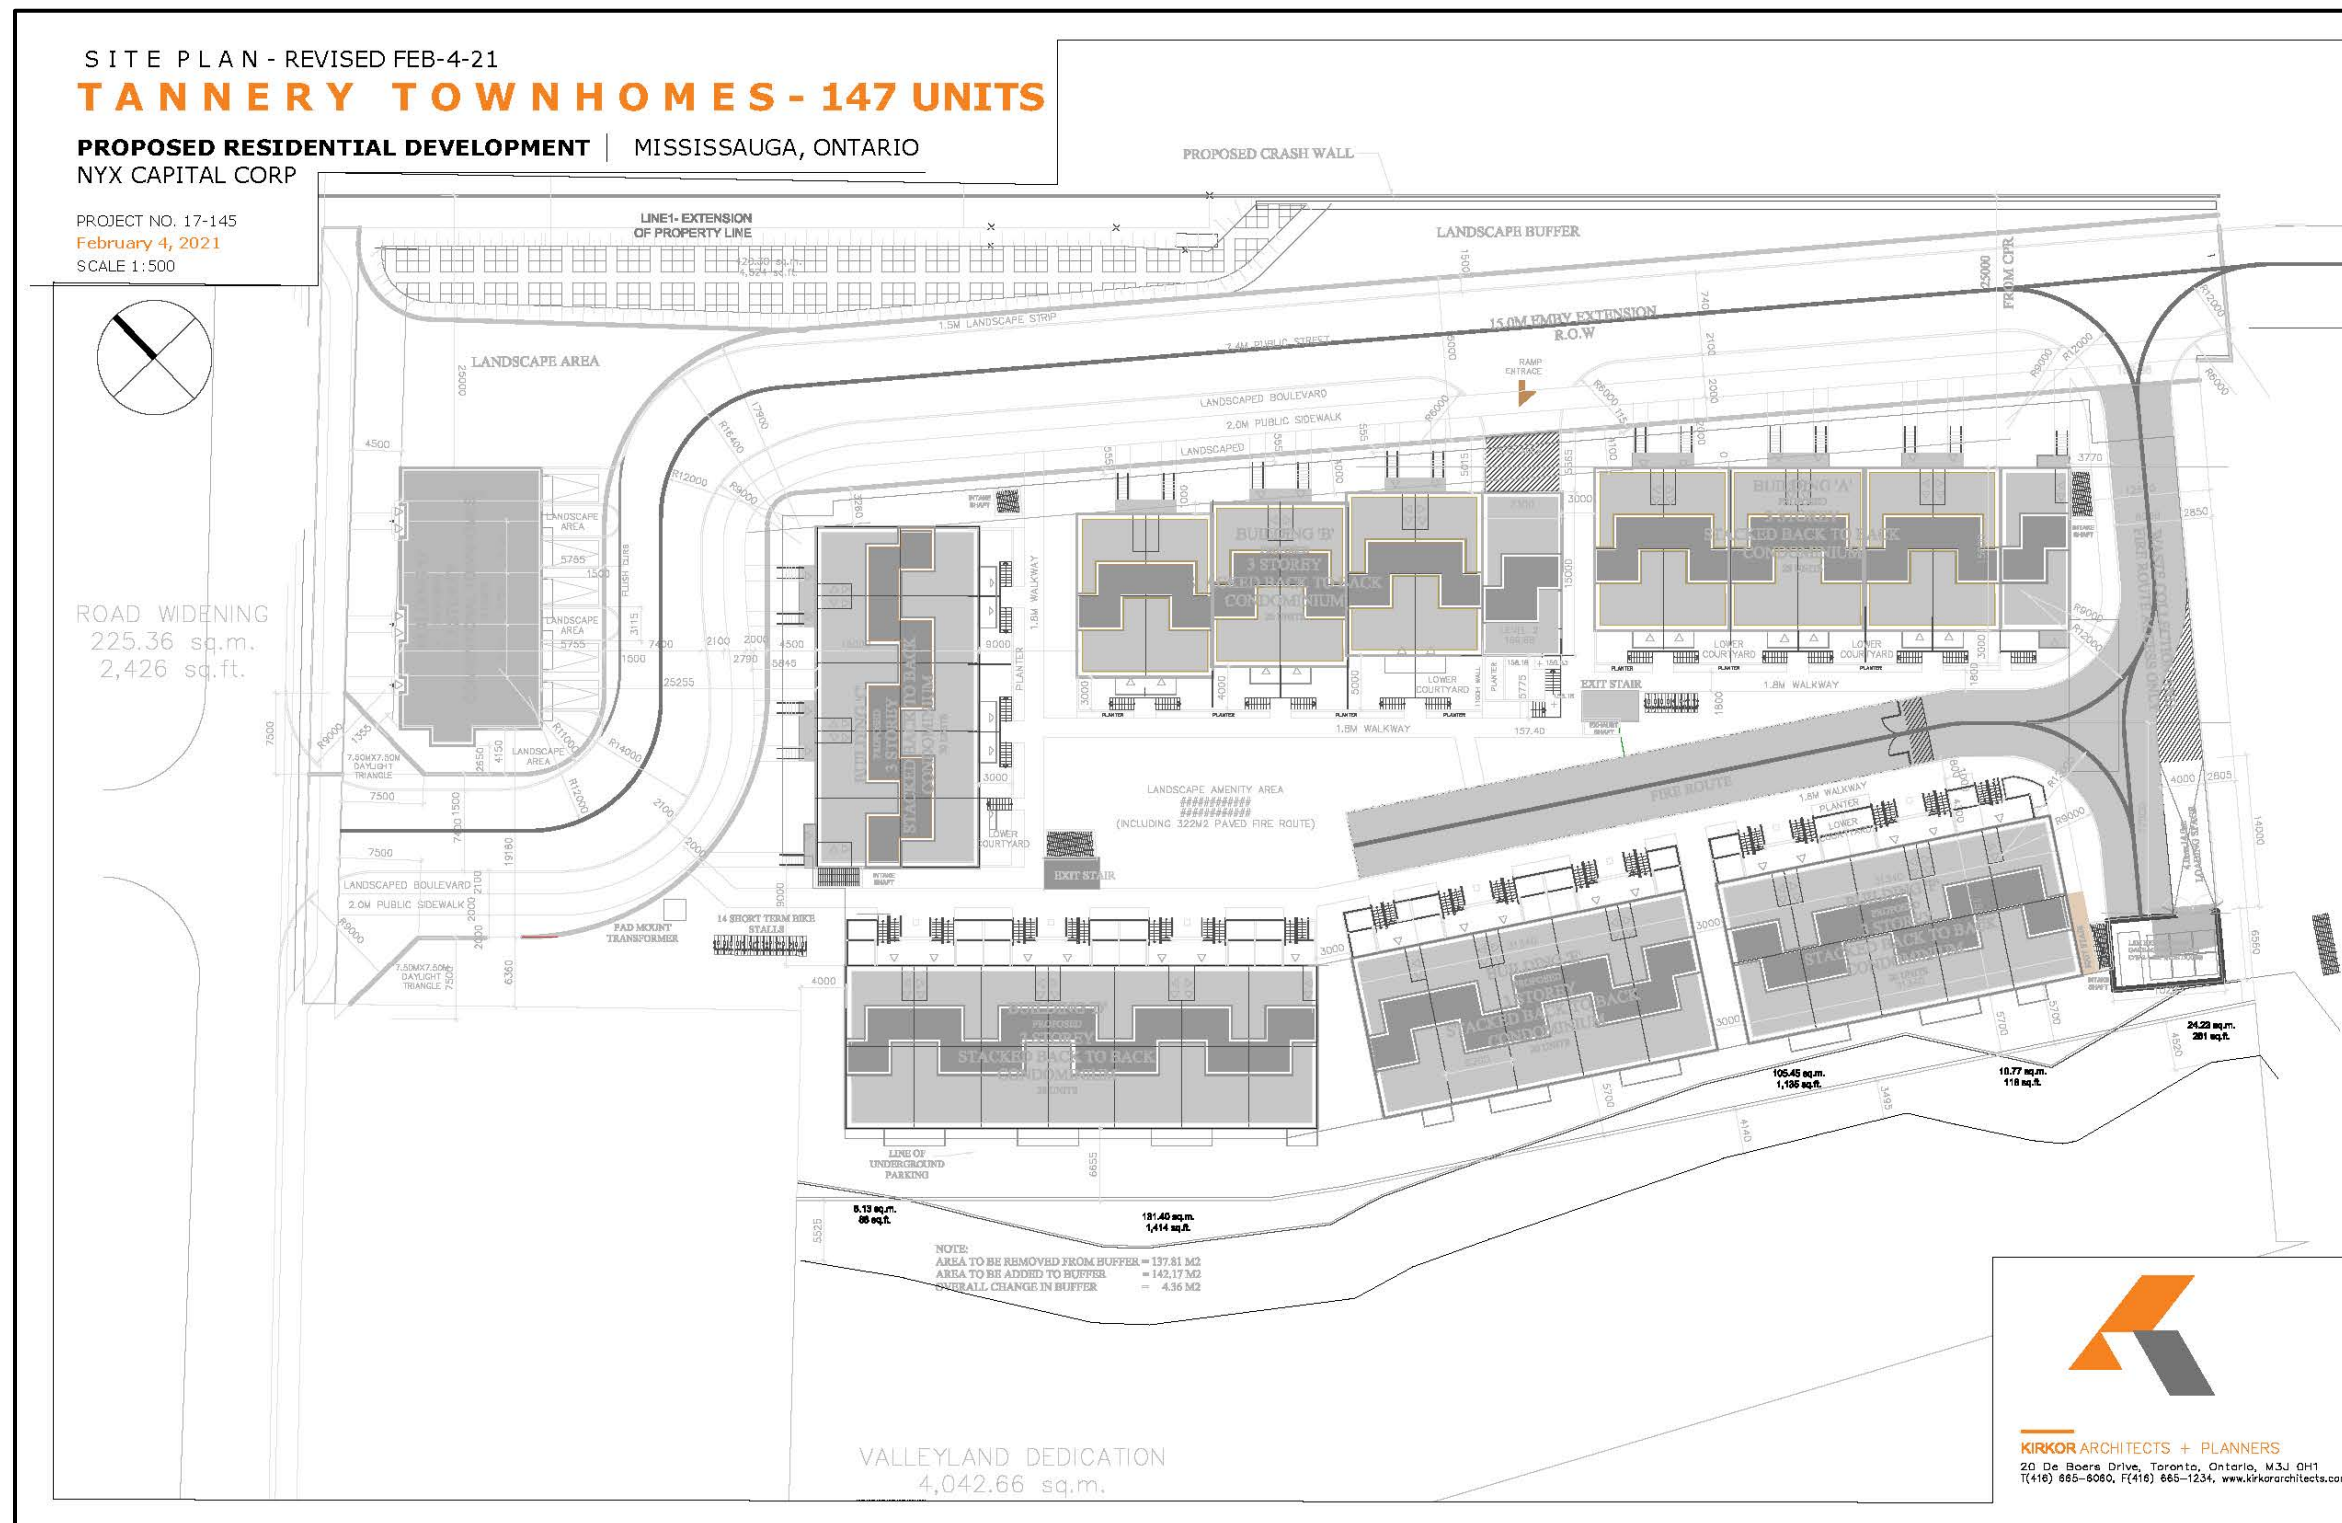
Proposed Site Plan (Kirkor Architects + Planners)
